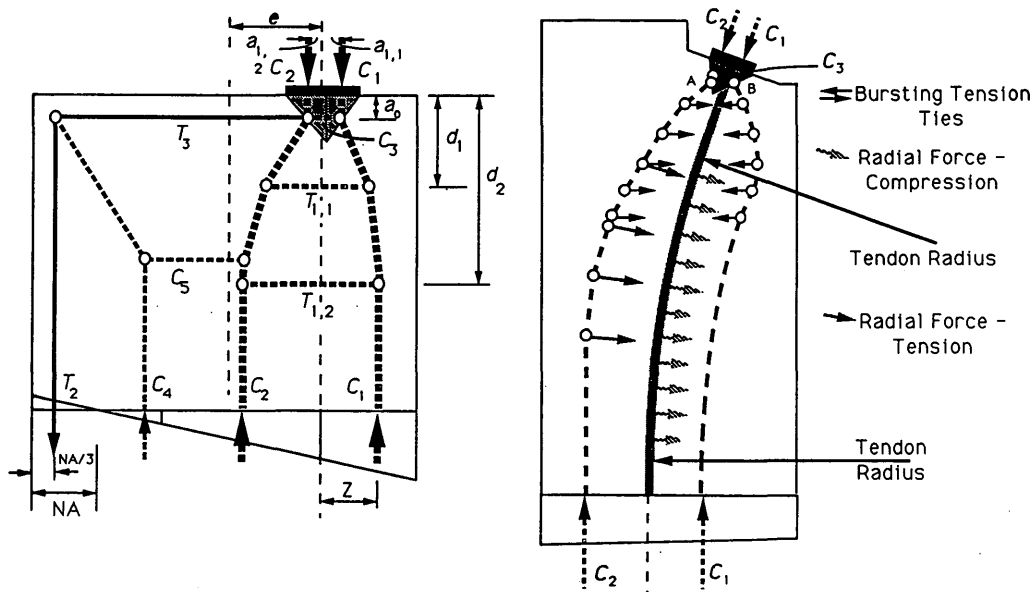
Eccentric anchorage STM: left, straight tendon outside kern; right, curved tendon with anchorage inclination.
